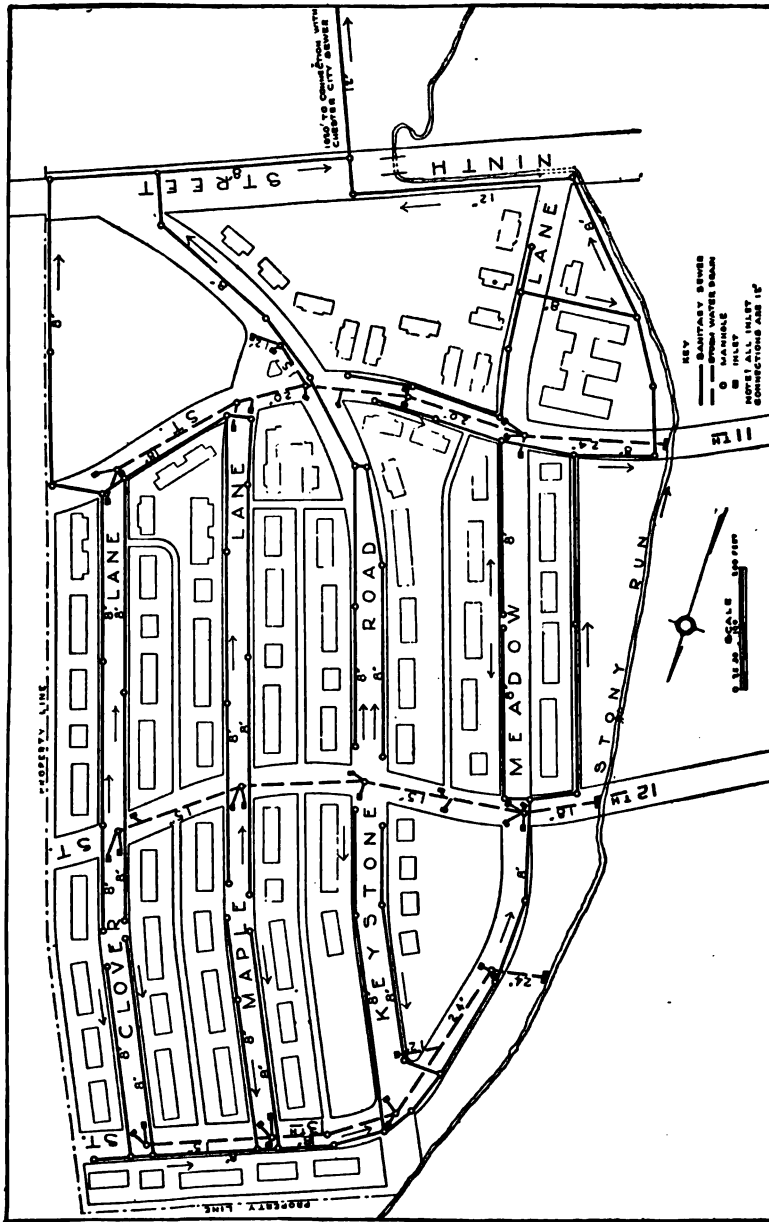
General plan of the sewerage and drainage system of Buckman Village, built by the Emergency Fleet Corporation; construction was facilitated by the duplicate system of sanitary sewers.
